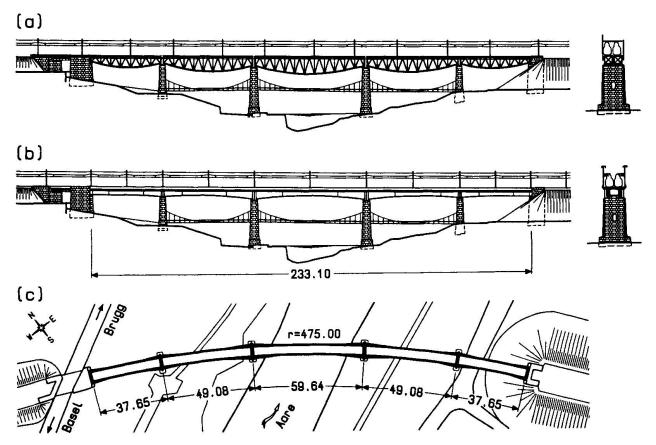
Overview: (a) Steel superstructure on natural stone masonry substructure; (b) New posttensioned concrete box girder on strengthened substructure; (c) Plan view of new bridge. Note: Dimensions in metres.
